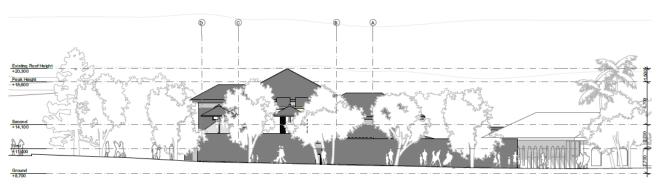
Existing north elevation. Source: Lockhart-Krause Architects, 2021
